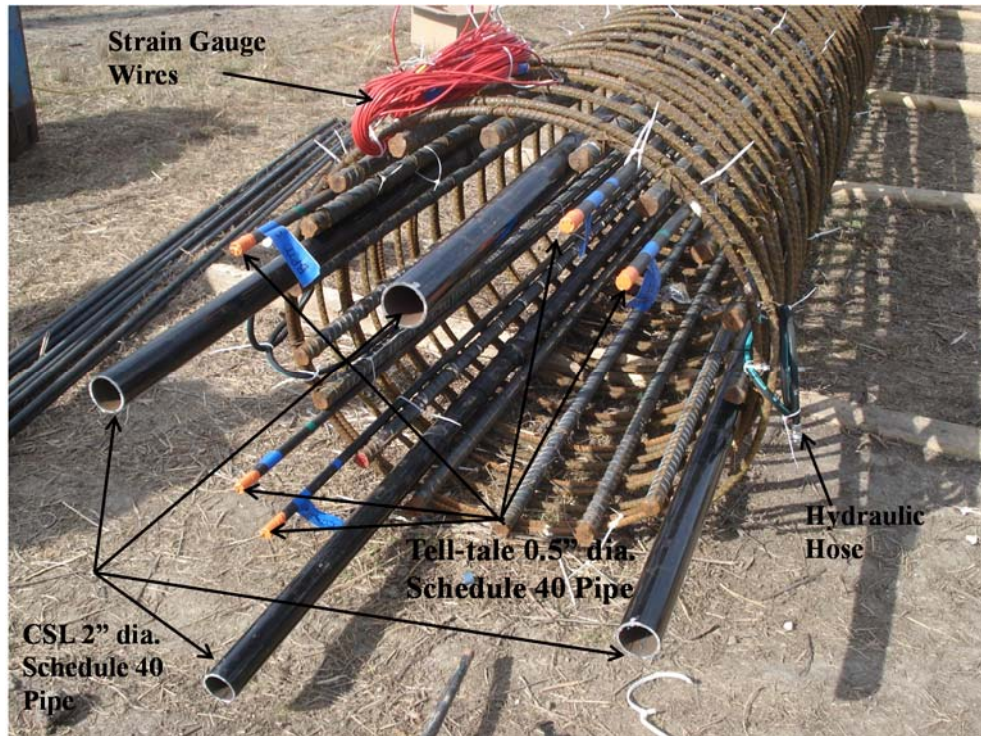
Photograph of an end view of the four-foot diameter shaft reinforcement cage.
